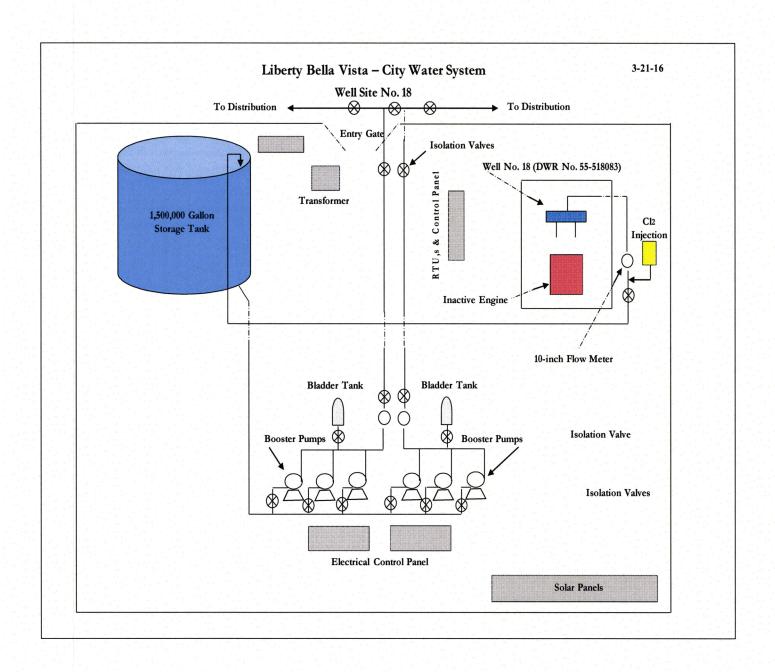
CITY WATER SYSTEM WELL SITE NO. 18
